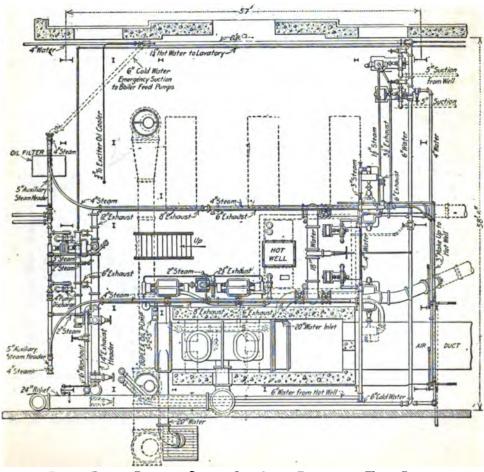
Plan of Basiment, Showing Live Steam, Exhaust and Water Piping.
